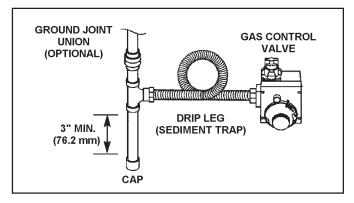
GAS PIPING WITH FLEXIBLE CONNECTOR.
